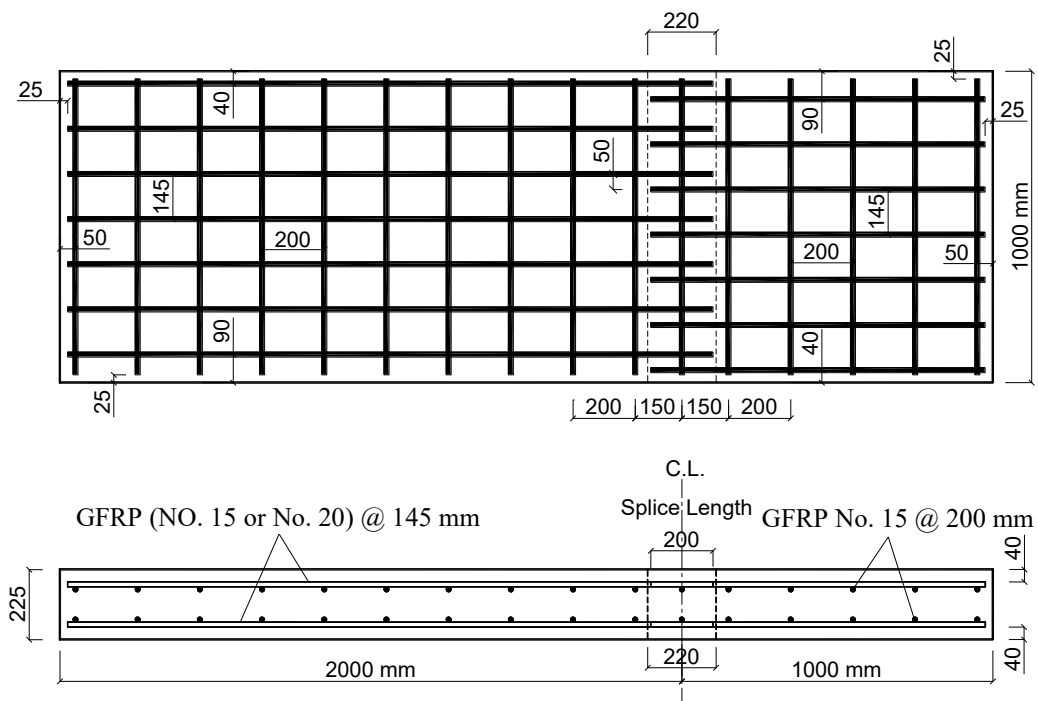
Concrete dimensions and reinforcement details of specimens G-200-15-A and G-200-20-A
